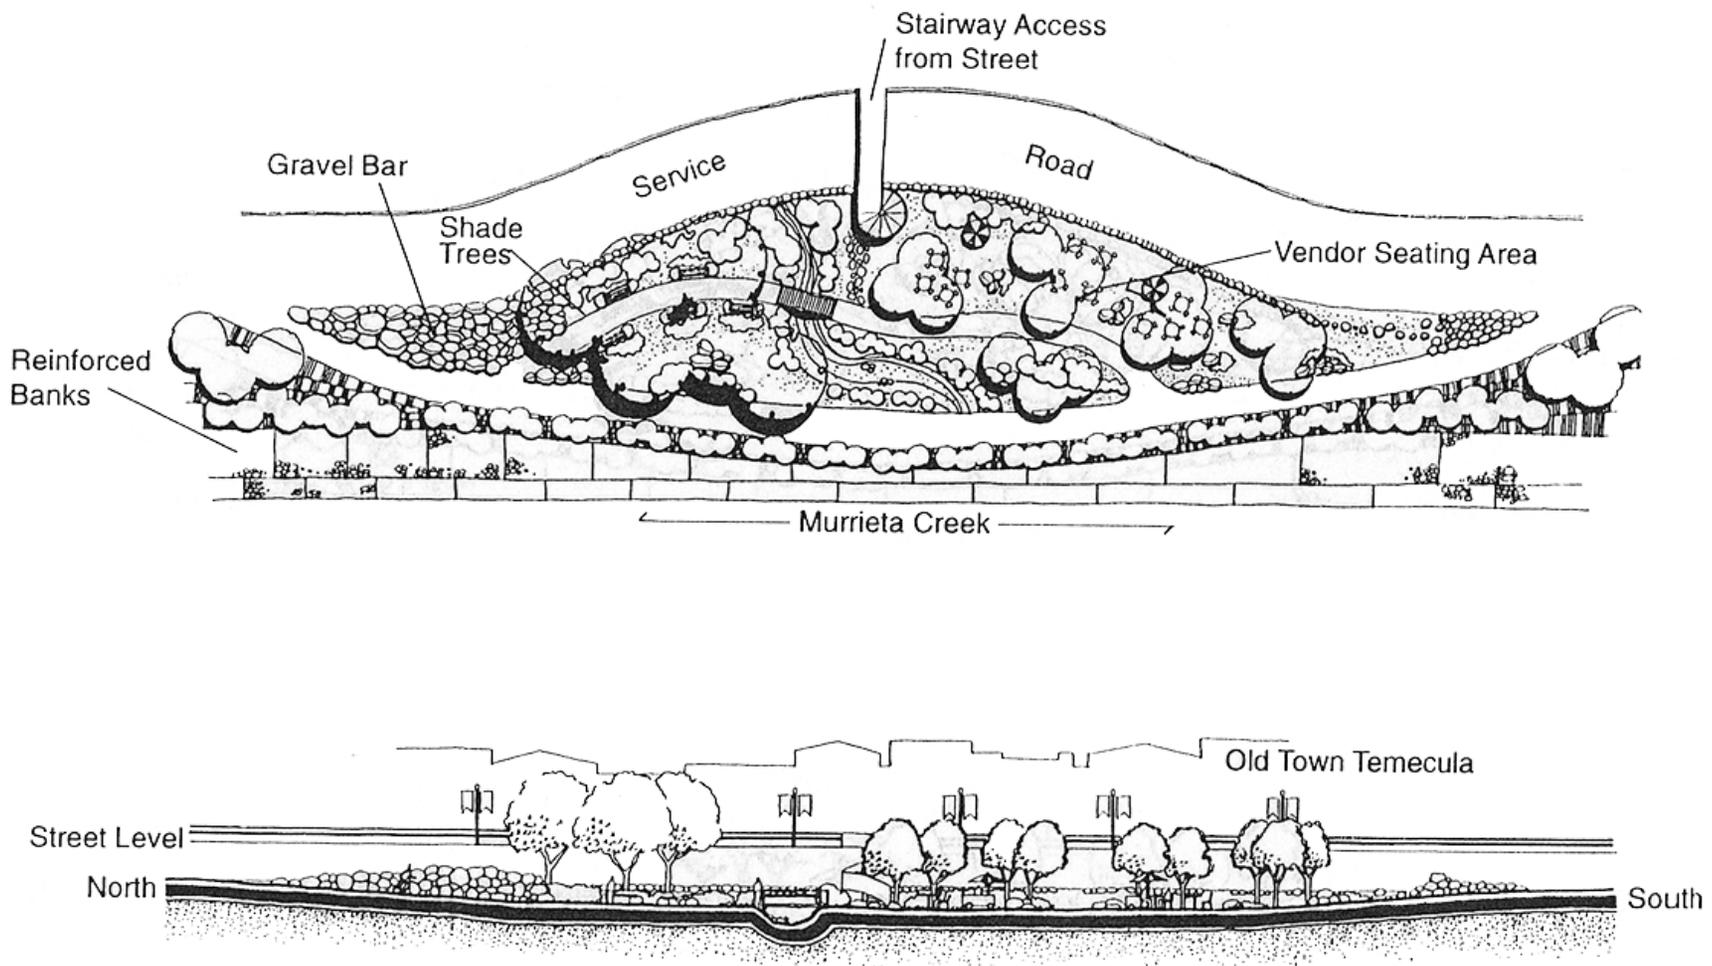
Pocket Park Plan and Section (*Integrated Management Plan for Murrieta Creek, 1992*)
